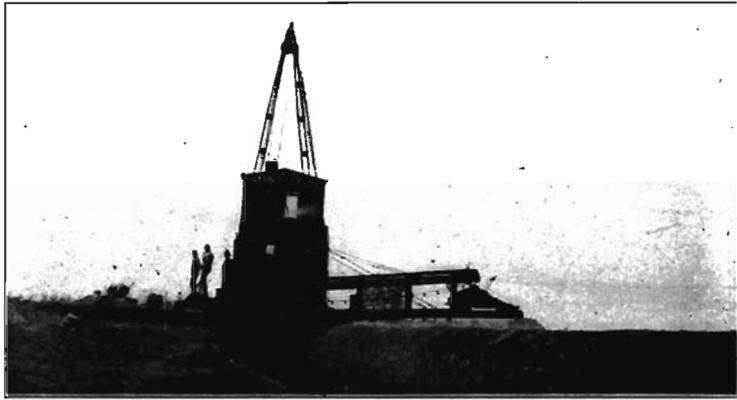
Coaling machine used by the Davy Burnt Clay Ballast Company.
